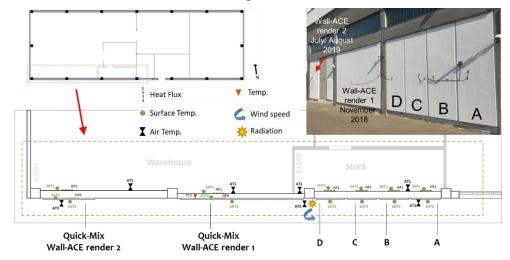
Floor plan: AGITEC storehouse. Feature test walls, sensors and installation.
